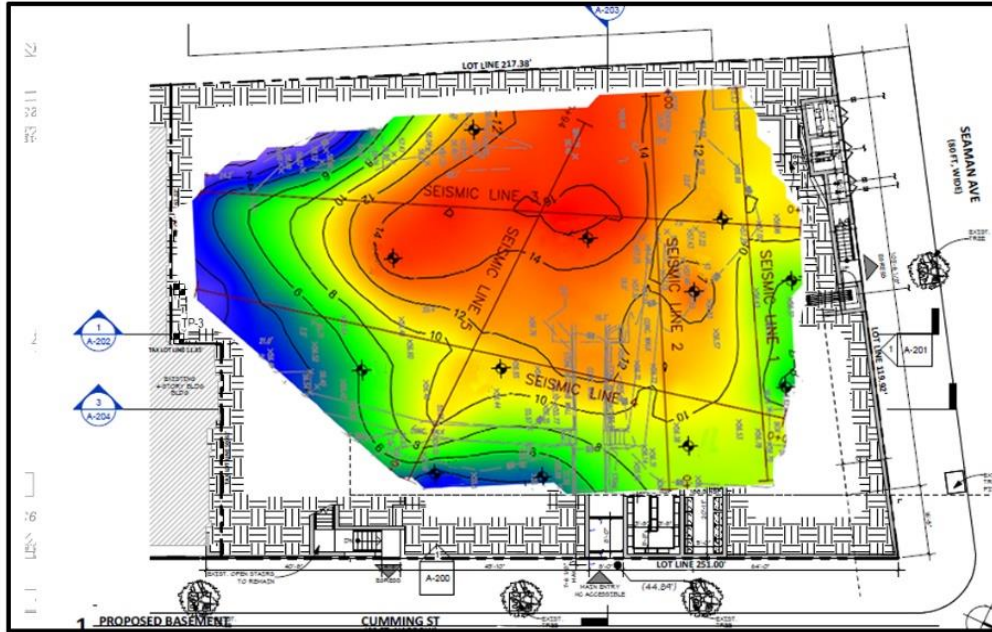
Superimposition of three plans showing the relative positions of the basement plan of the proposed construction, the location of soil borings and test pits, and the model of the project site's subsurface topography (GFF Architects LLP, GEODesign Inc. and Hager-Richter Geoscience Inc., respectively)
